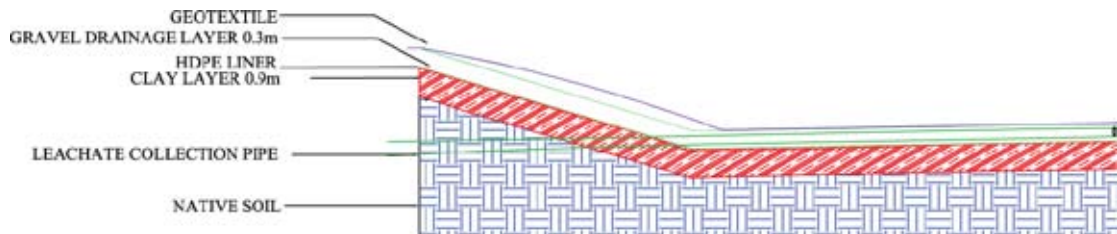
Placement of the Gravel Drainage Layer and Geotextile over the Clay liner
